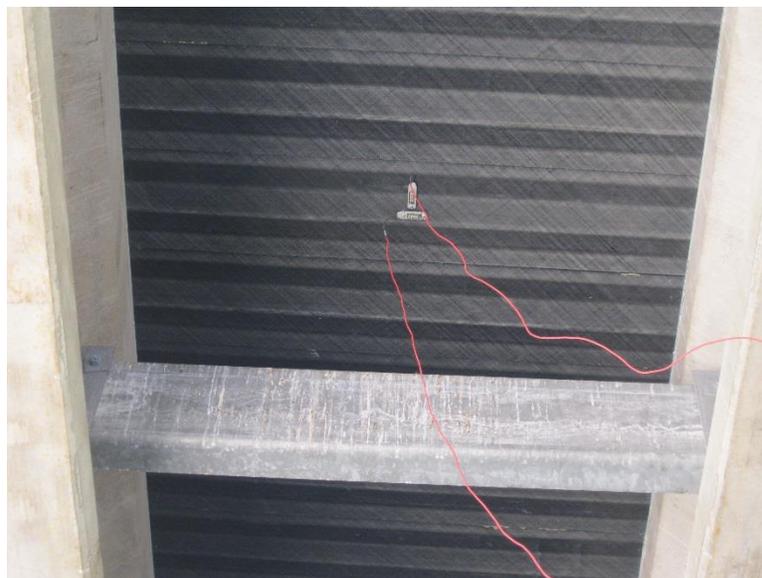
US 151 northbound over STH 26 Service Road deck strain gage pairing
